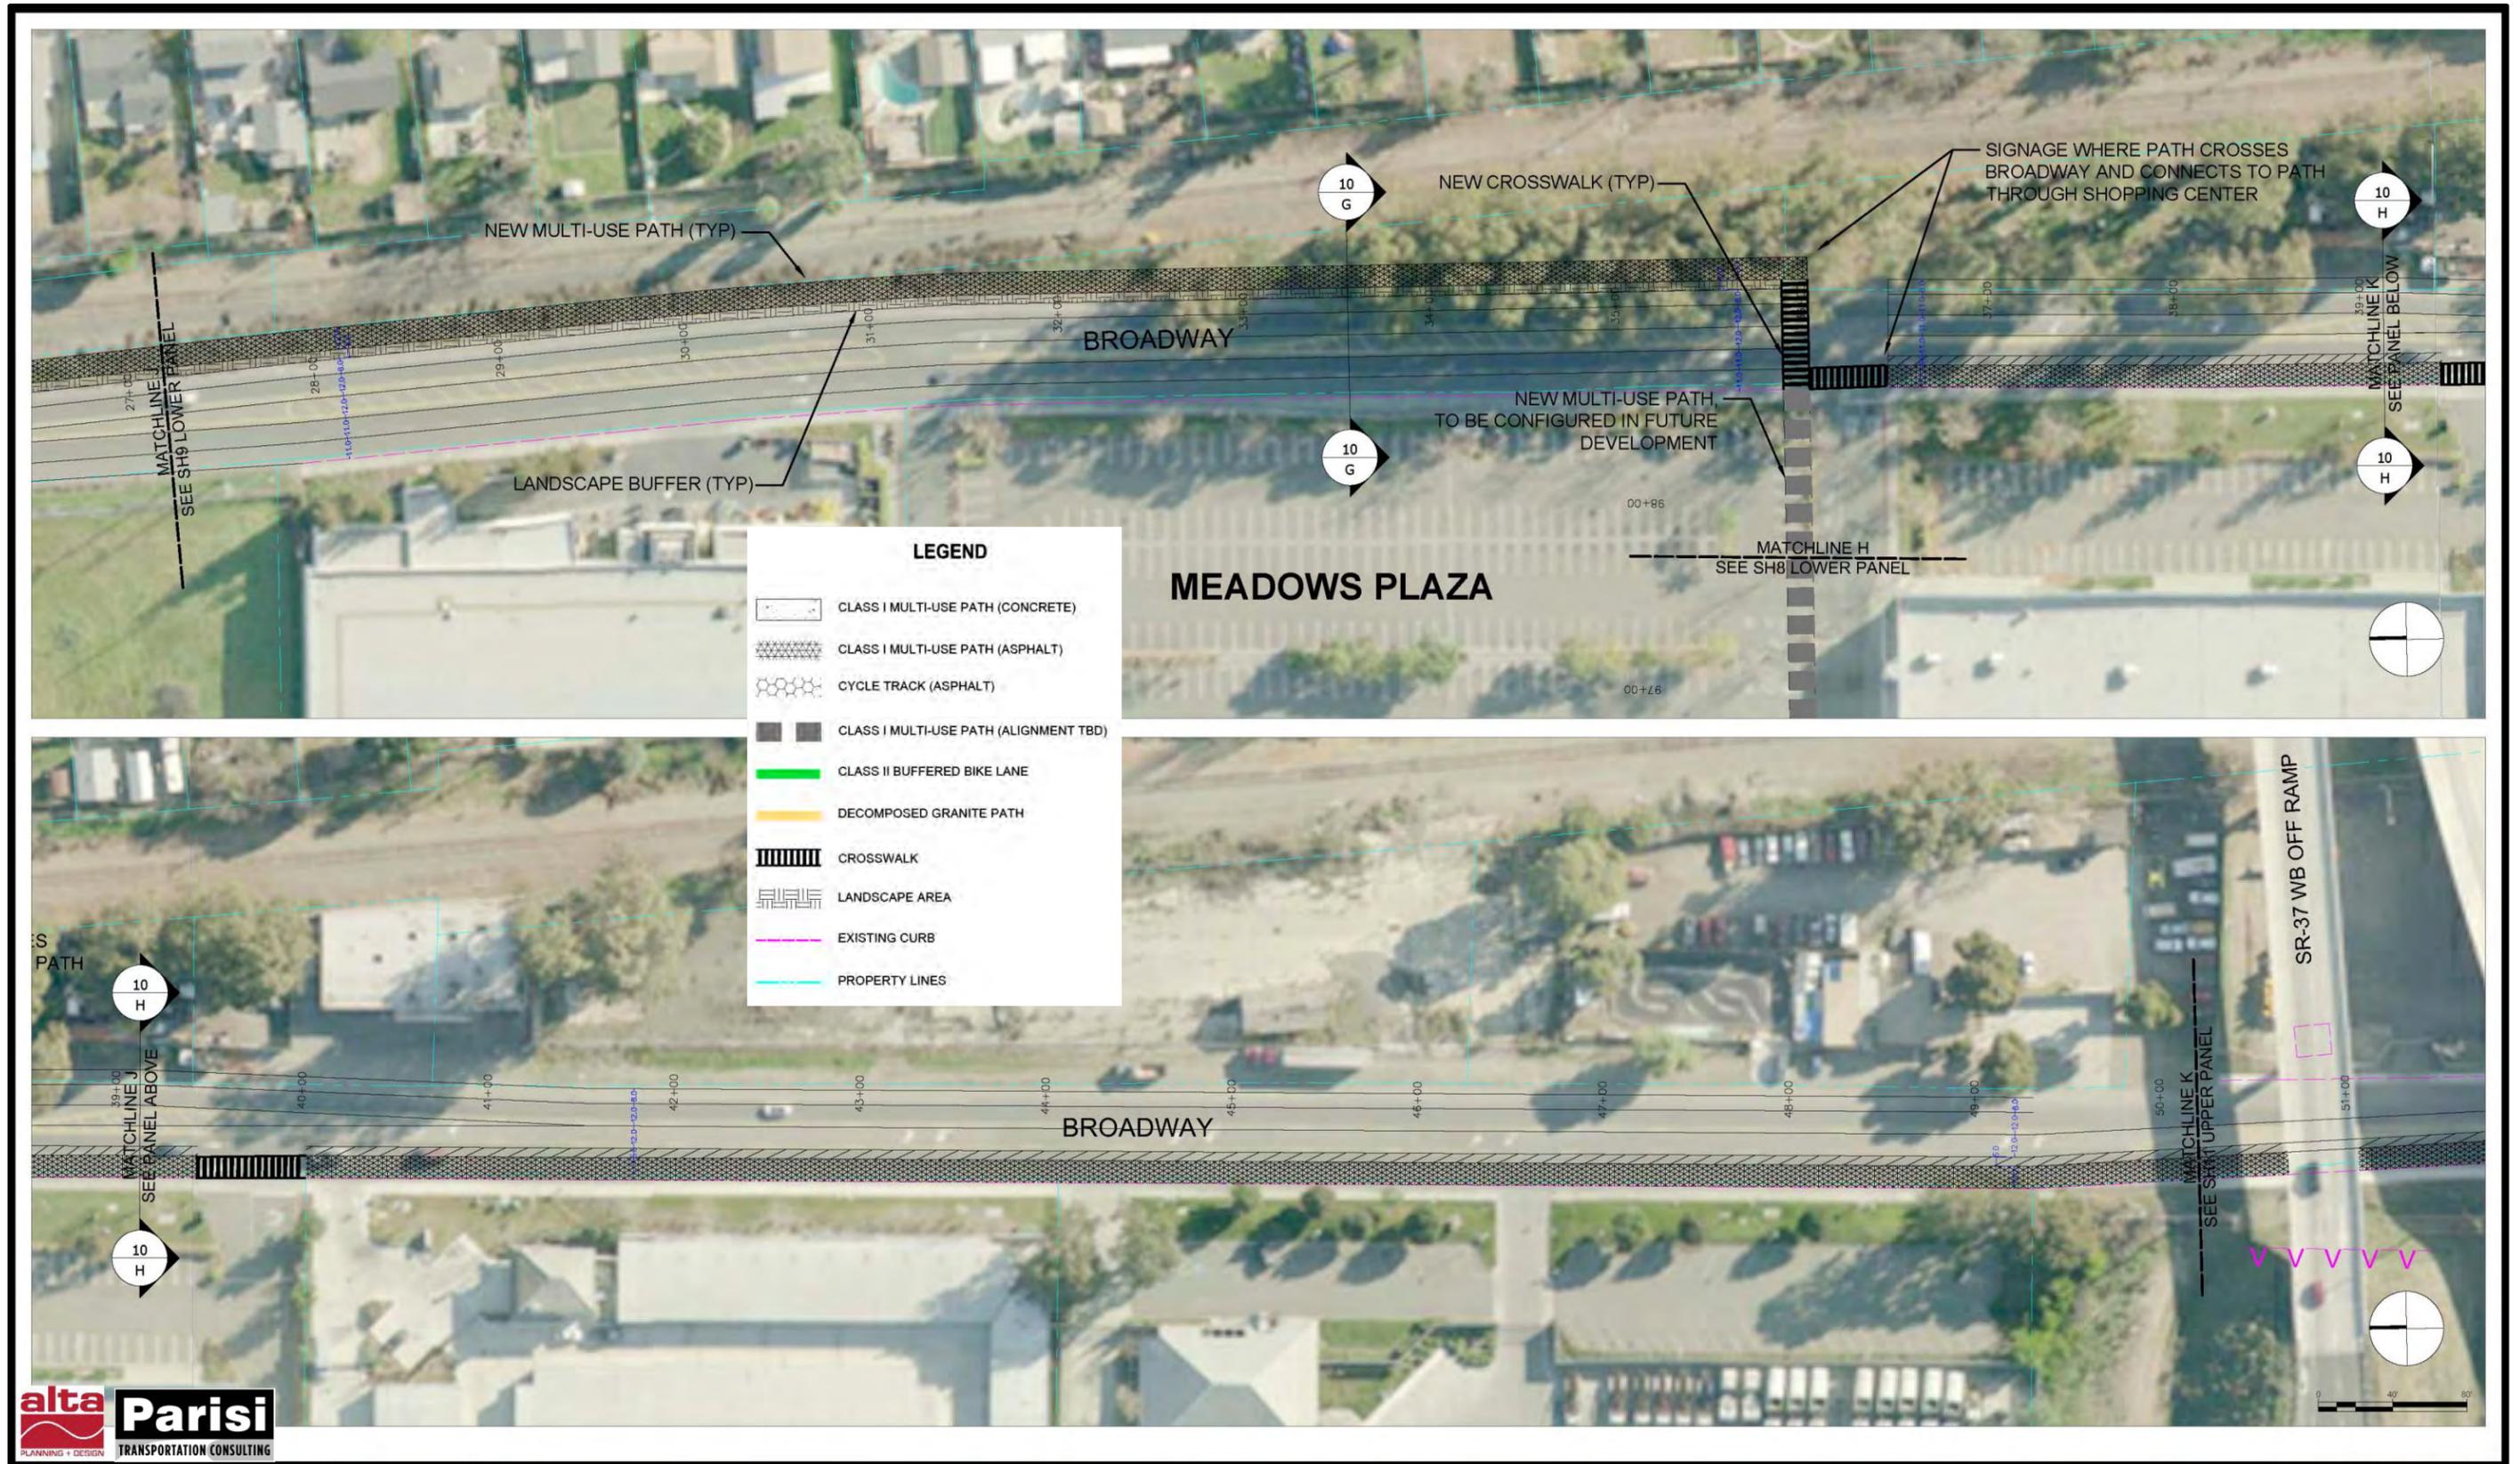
Segment 3 Detail Map B (plan set sheet 10 of 13)
